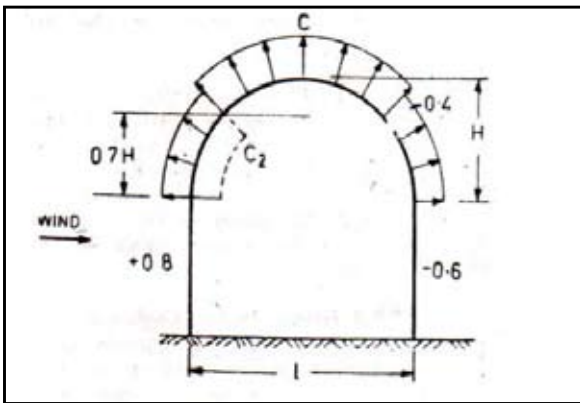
Wind pressure distribution for roof on elevated structure as per IS: 875(part-3) - 1987
